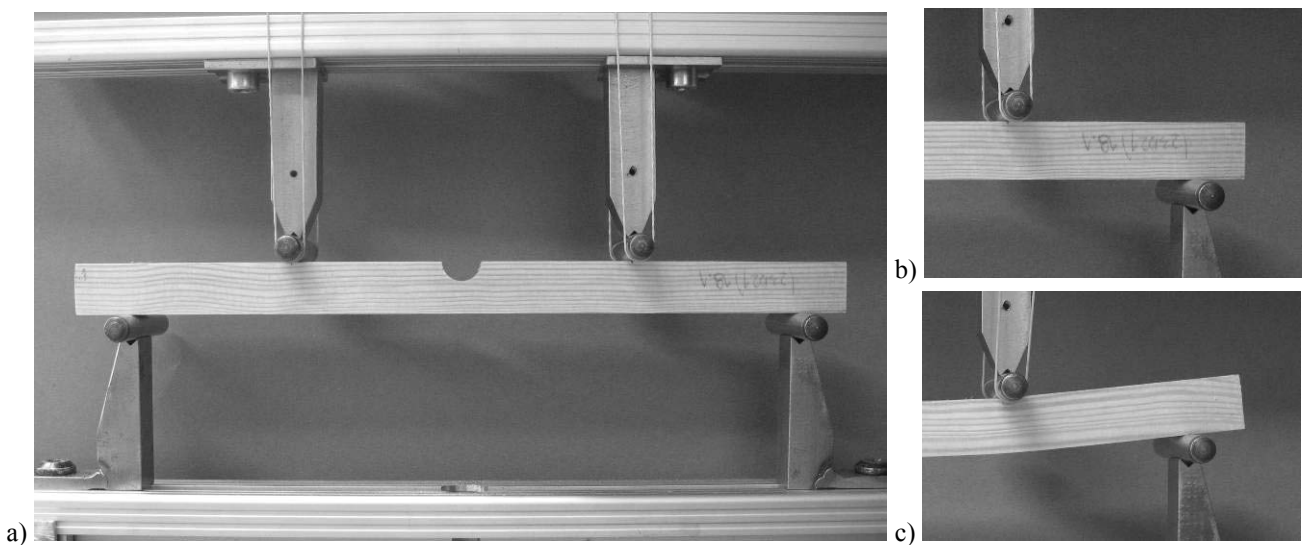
Experimental setup in the testing machine (bending load, unrepaired compression failure beam).
